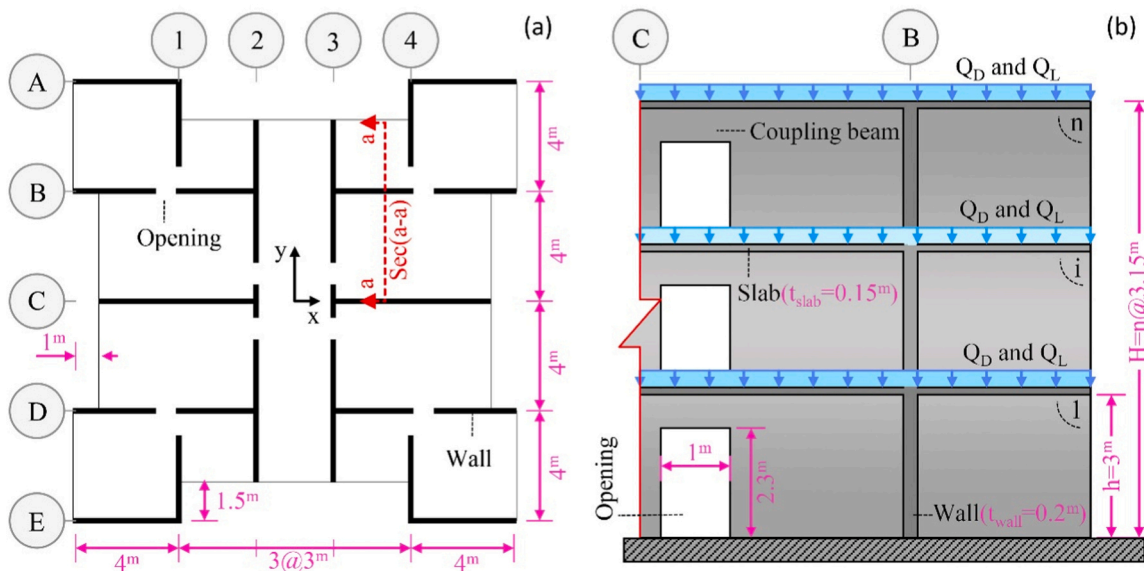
Studied Tunnel-Form Buildings (a) Typical story plan (b) Elevation of the vertical section a-a in a hypothetical n-story model.
